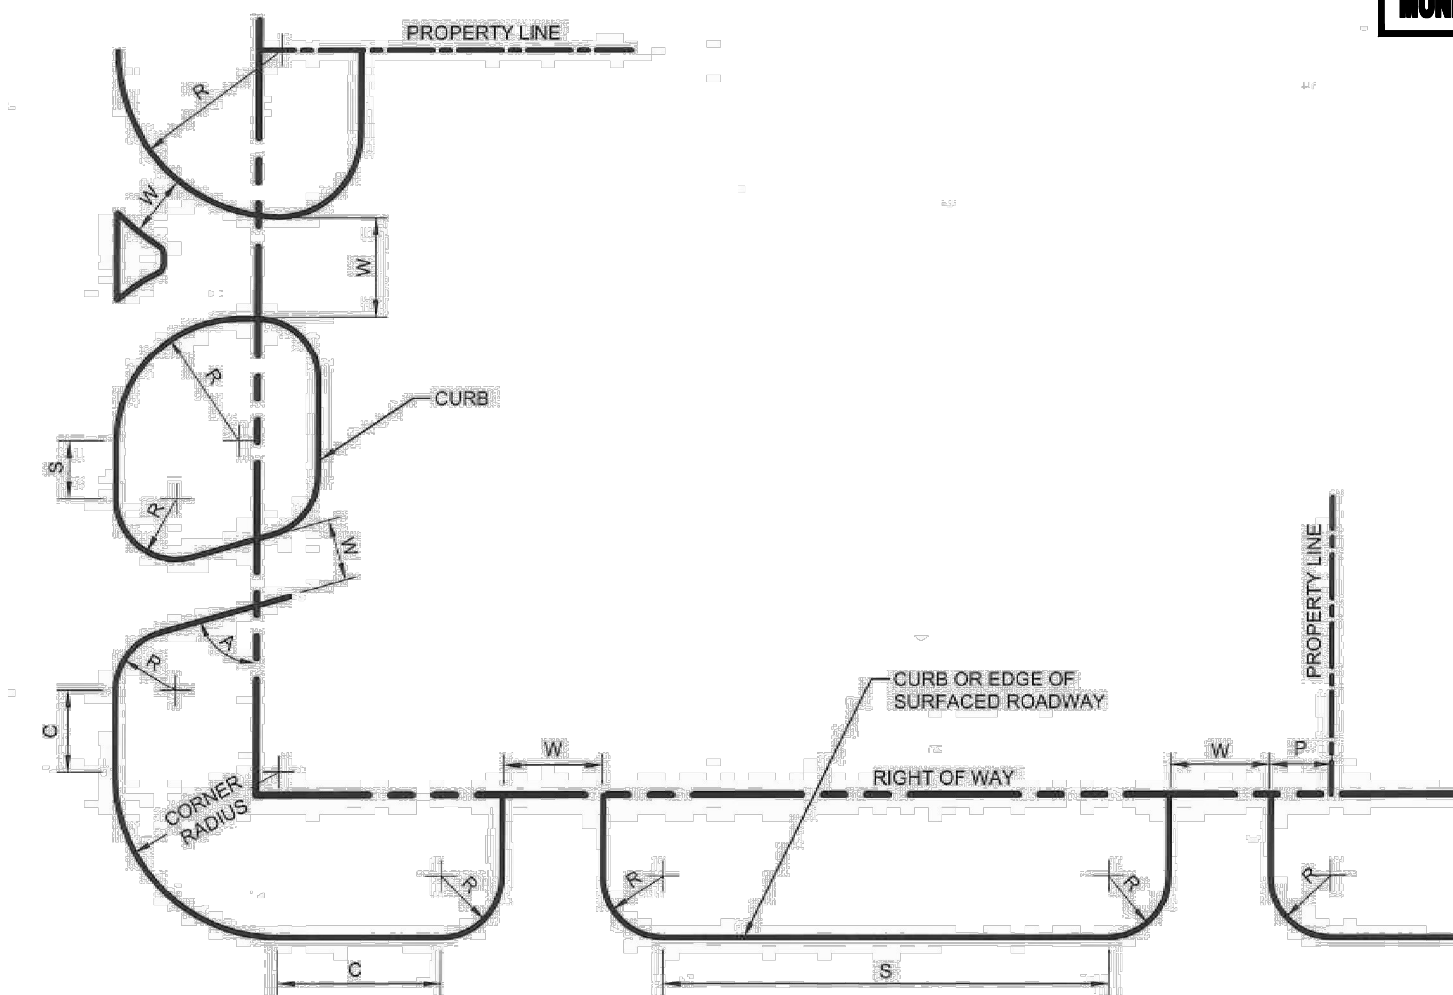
MORRIS COUNTY TYPICAL DETAIL DRIVEWAY LOCATION DIAGRAM NOT TO SCALE 5/2011 MOC
